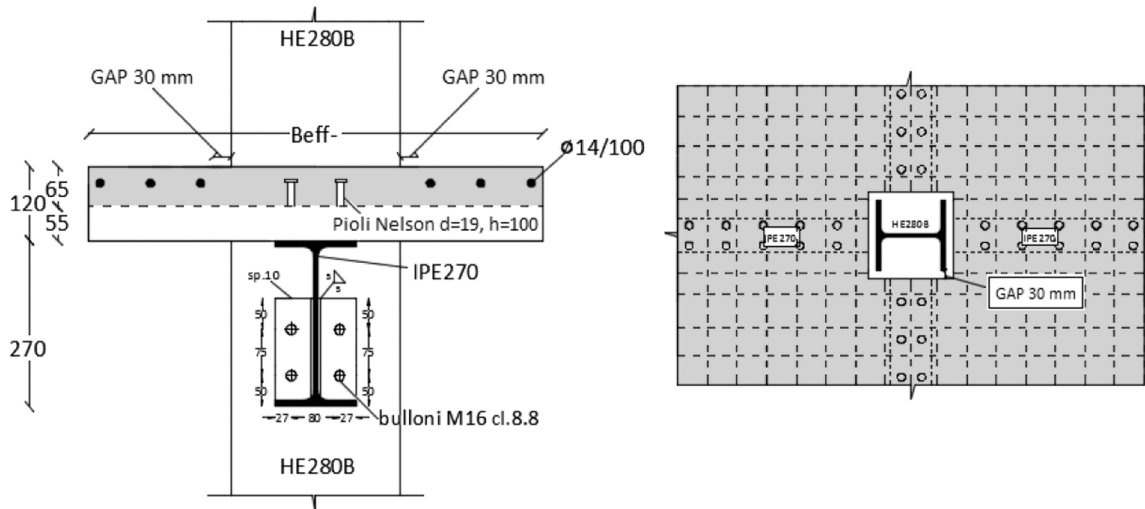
Reference steel-concrete composite section: cross-section and plan view.
